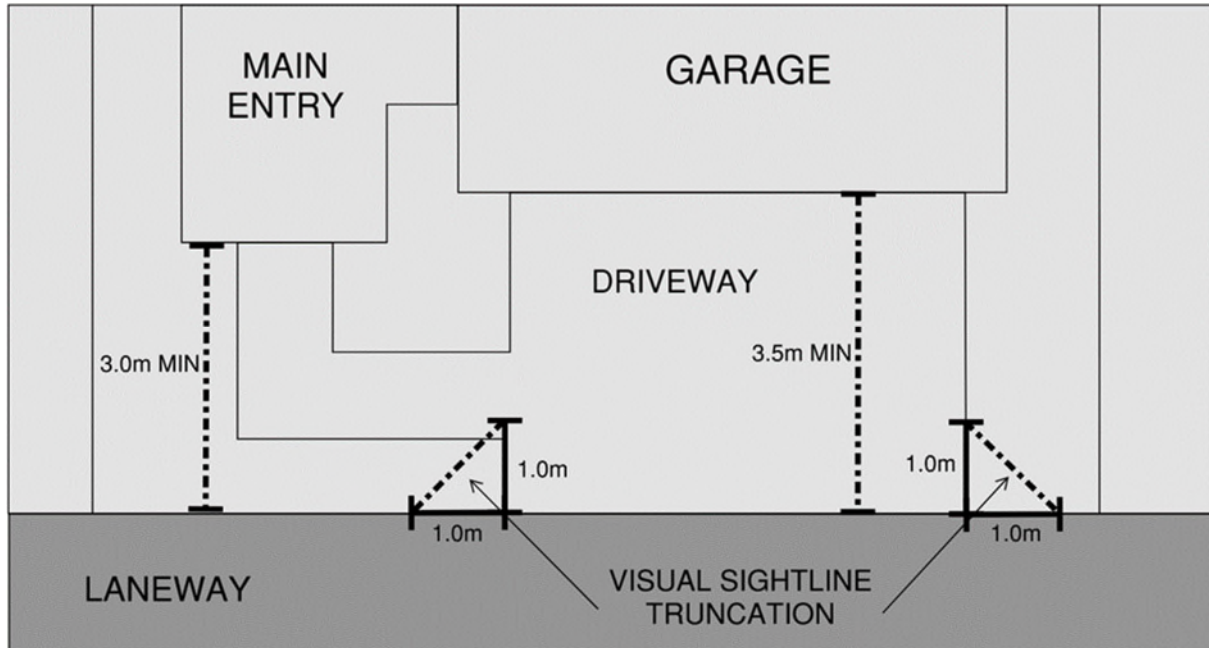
Building Laneway Setbacks and Visual Sightline Truncation Areas
